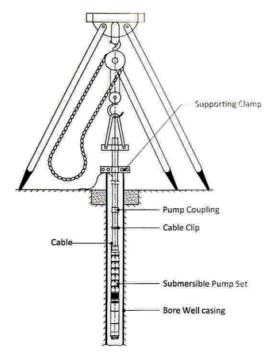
TYPICAL TRIPOD STAND FOR LOWERING / LIFTING SUBMERSIBLE PUMP SETS
